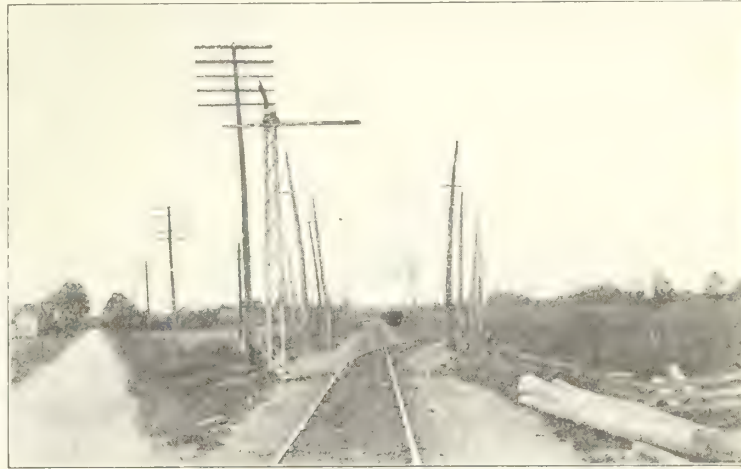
St. Thomas Yard, Looking North from Southerly Approach.
